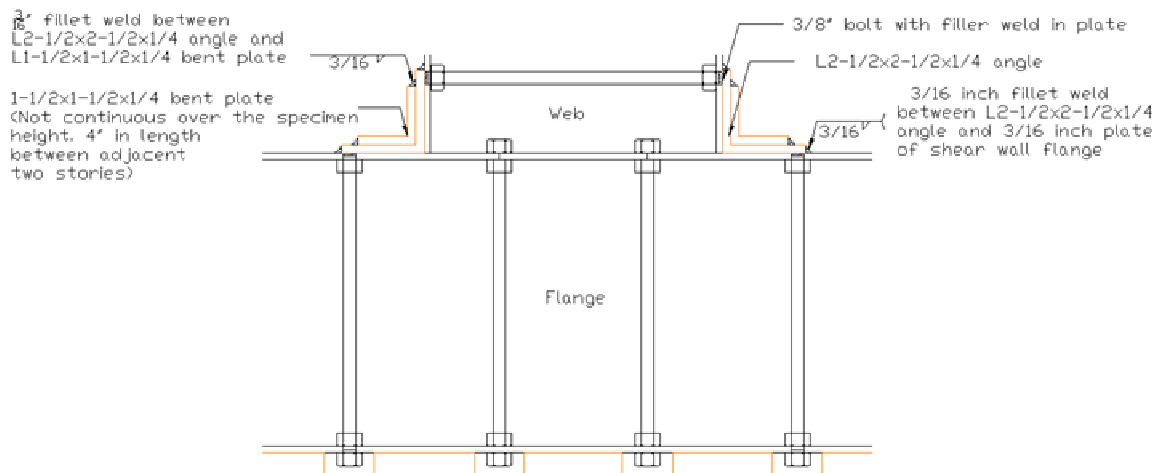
Connection details at the intersection of the web and flange plate assemblies – Plan view
